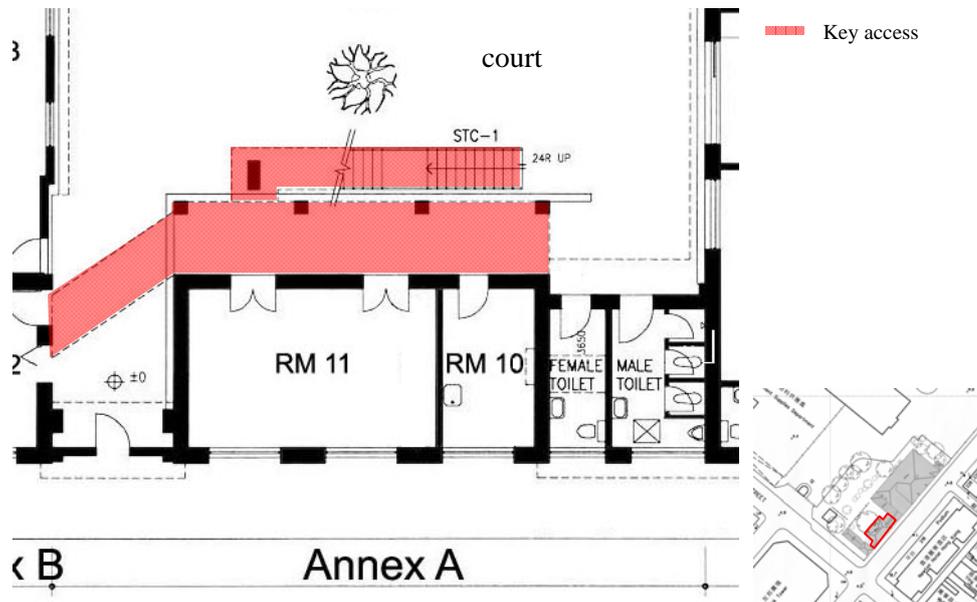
Existing ground floor plan of Annex A at No. 12 Oil Street, North Point (1:200).
